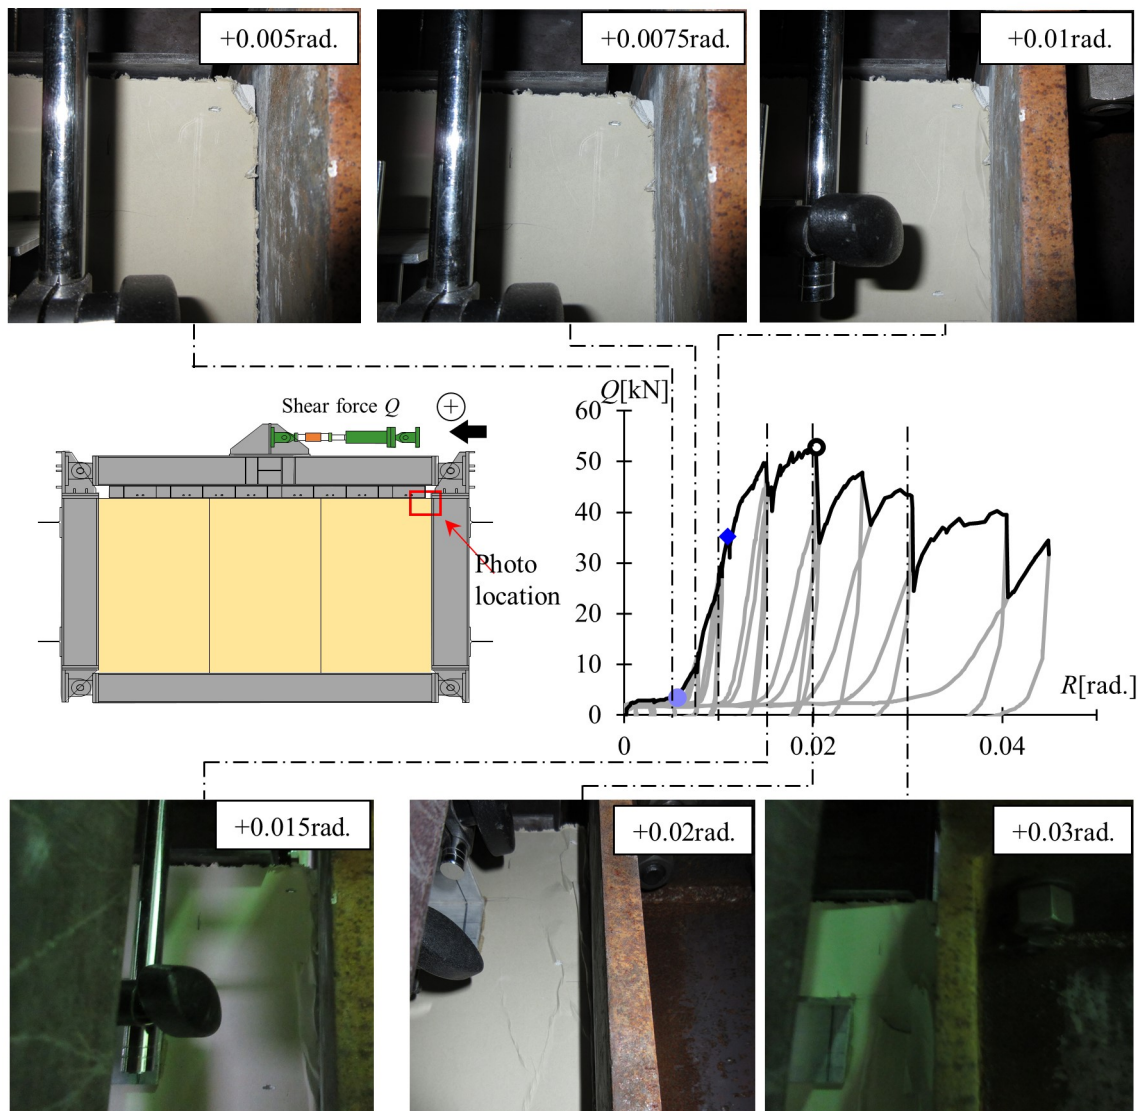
Damage to the gypsum board at loading cycle from 0.005 rad to 0.03 rad (Specimen S12.5\*4, top right corner, reverse).
